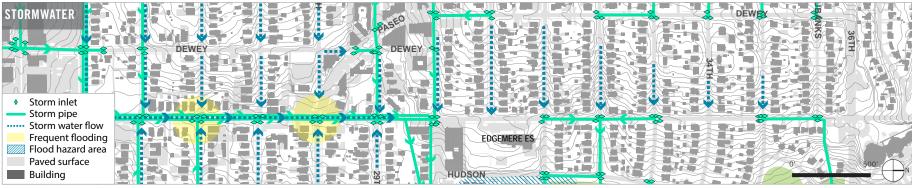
Stormwater flow on Walker Avenue. A large volume of runoff from outside the project area enters the drainage network south of Edgemere Elementary School
